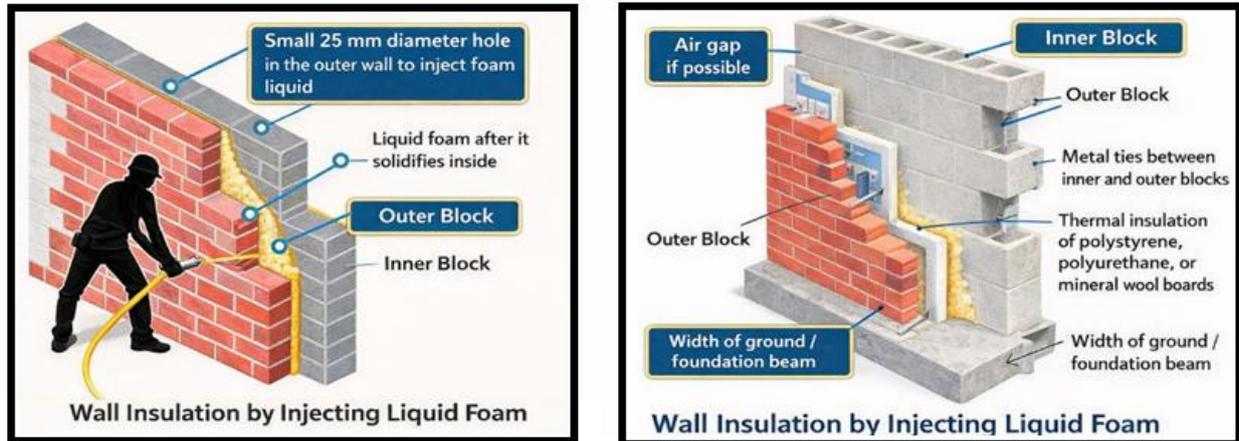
Wall insulation using liquid foam injection between masonry blocks
